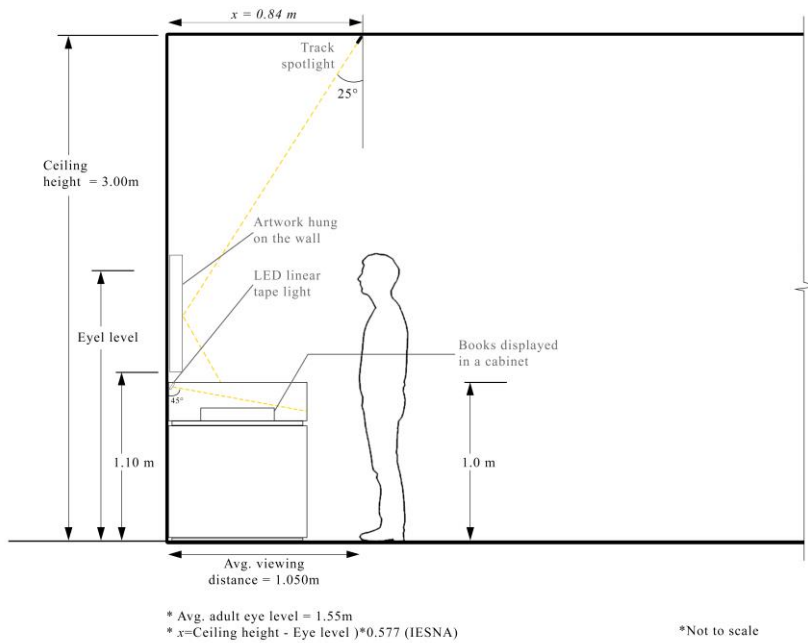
CC' Section – The mounted luminaire details in Room 2
